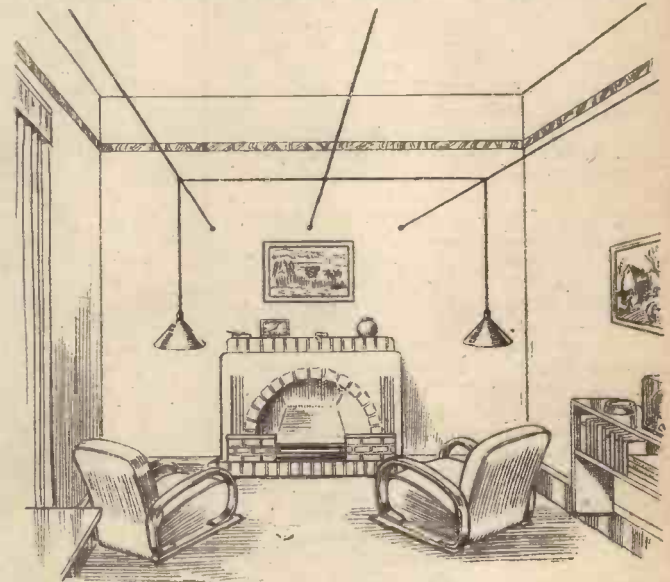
Arrangement of lights in living-room. Separately switched 12 or 18 watt bulbs suspended by flex from bare 7/22 aerial wire stretched from wall to wall at a height of about 9ft.
